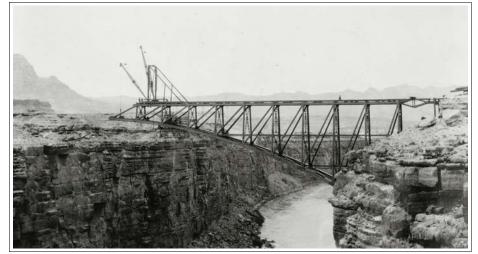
Navajo Bridge, last panel of south arm under construction, 1928. Library of Congress.
